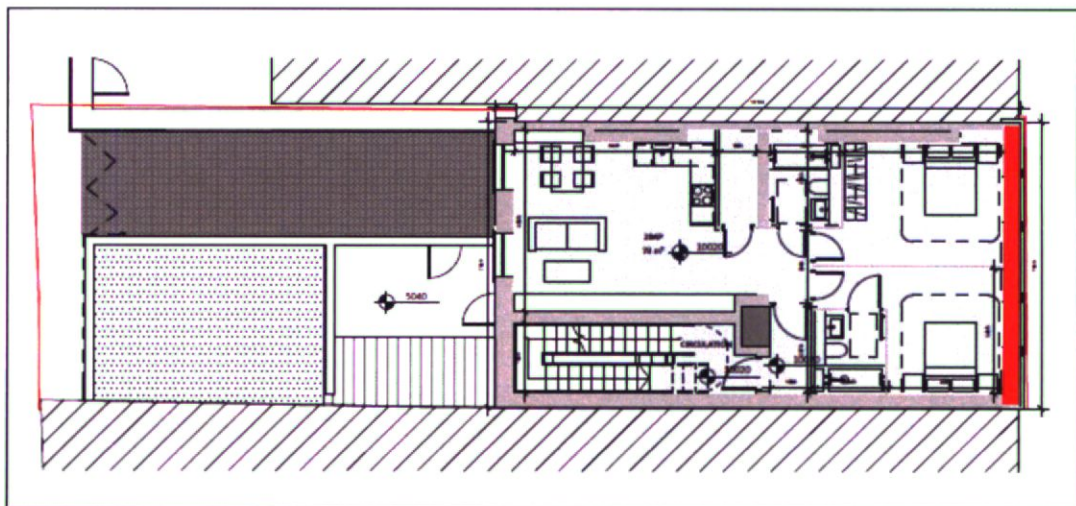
4: Glazing Requirement – 61 O'Connell Street
